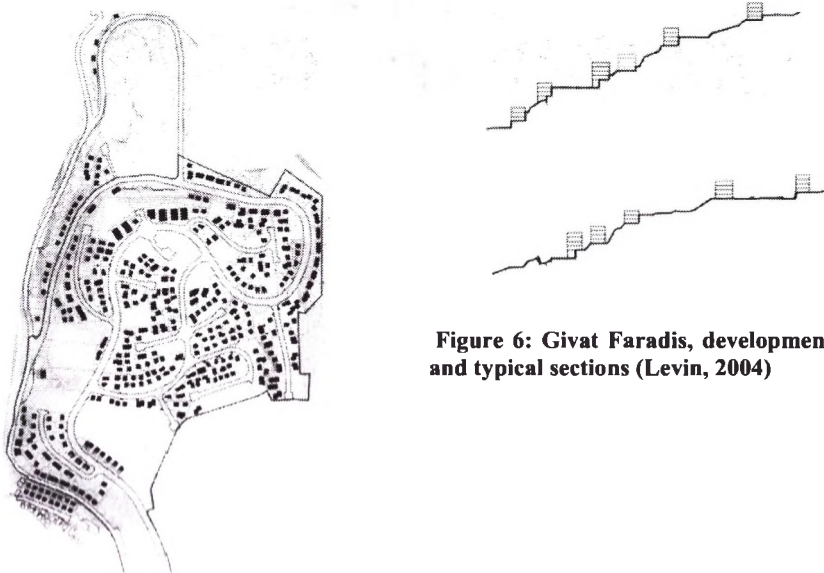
Givat Faradis, development plan and typical sections (Levin, 2004)
